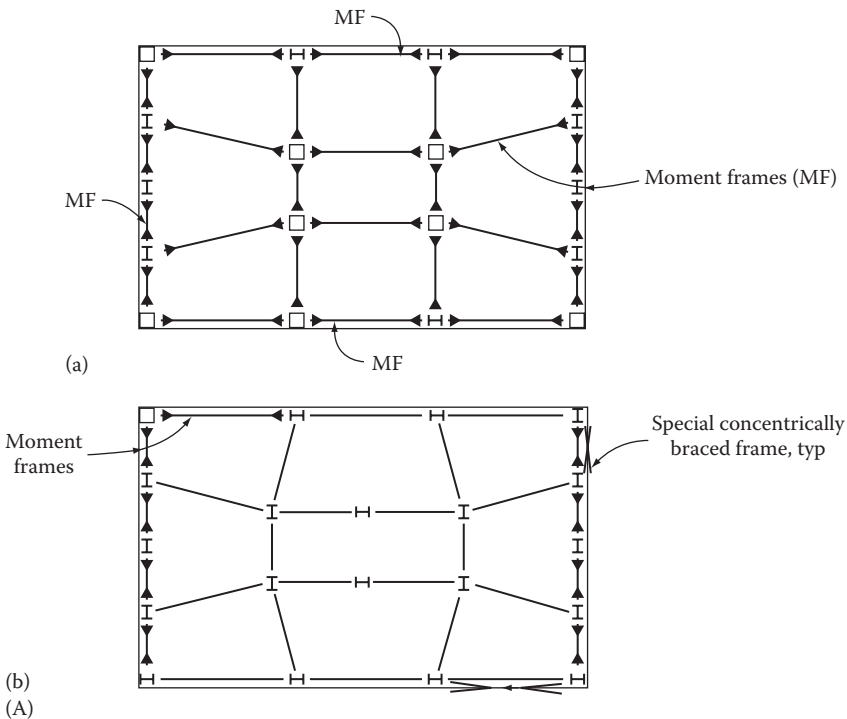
(A) (a) Highly redundant building and (b) not-so-redundant building.
